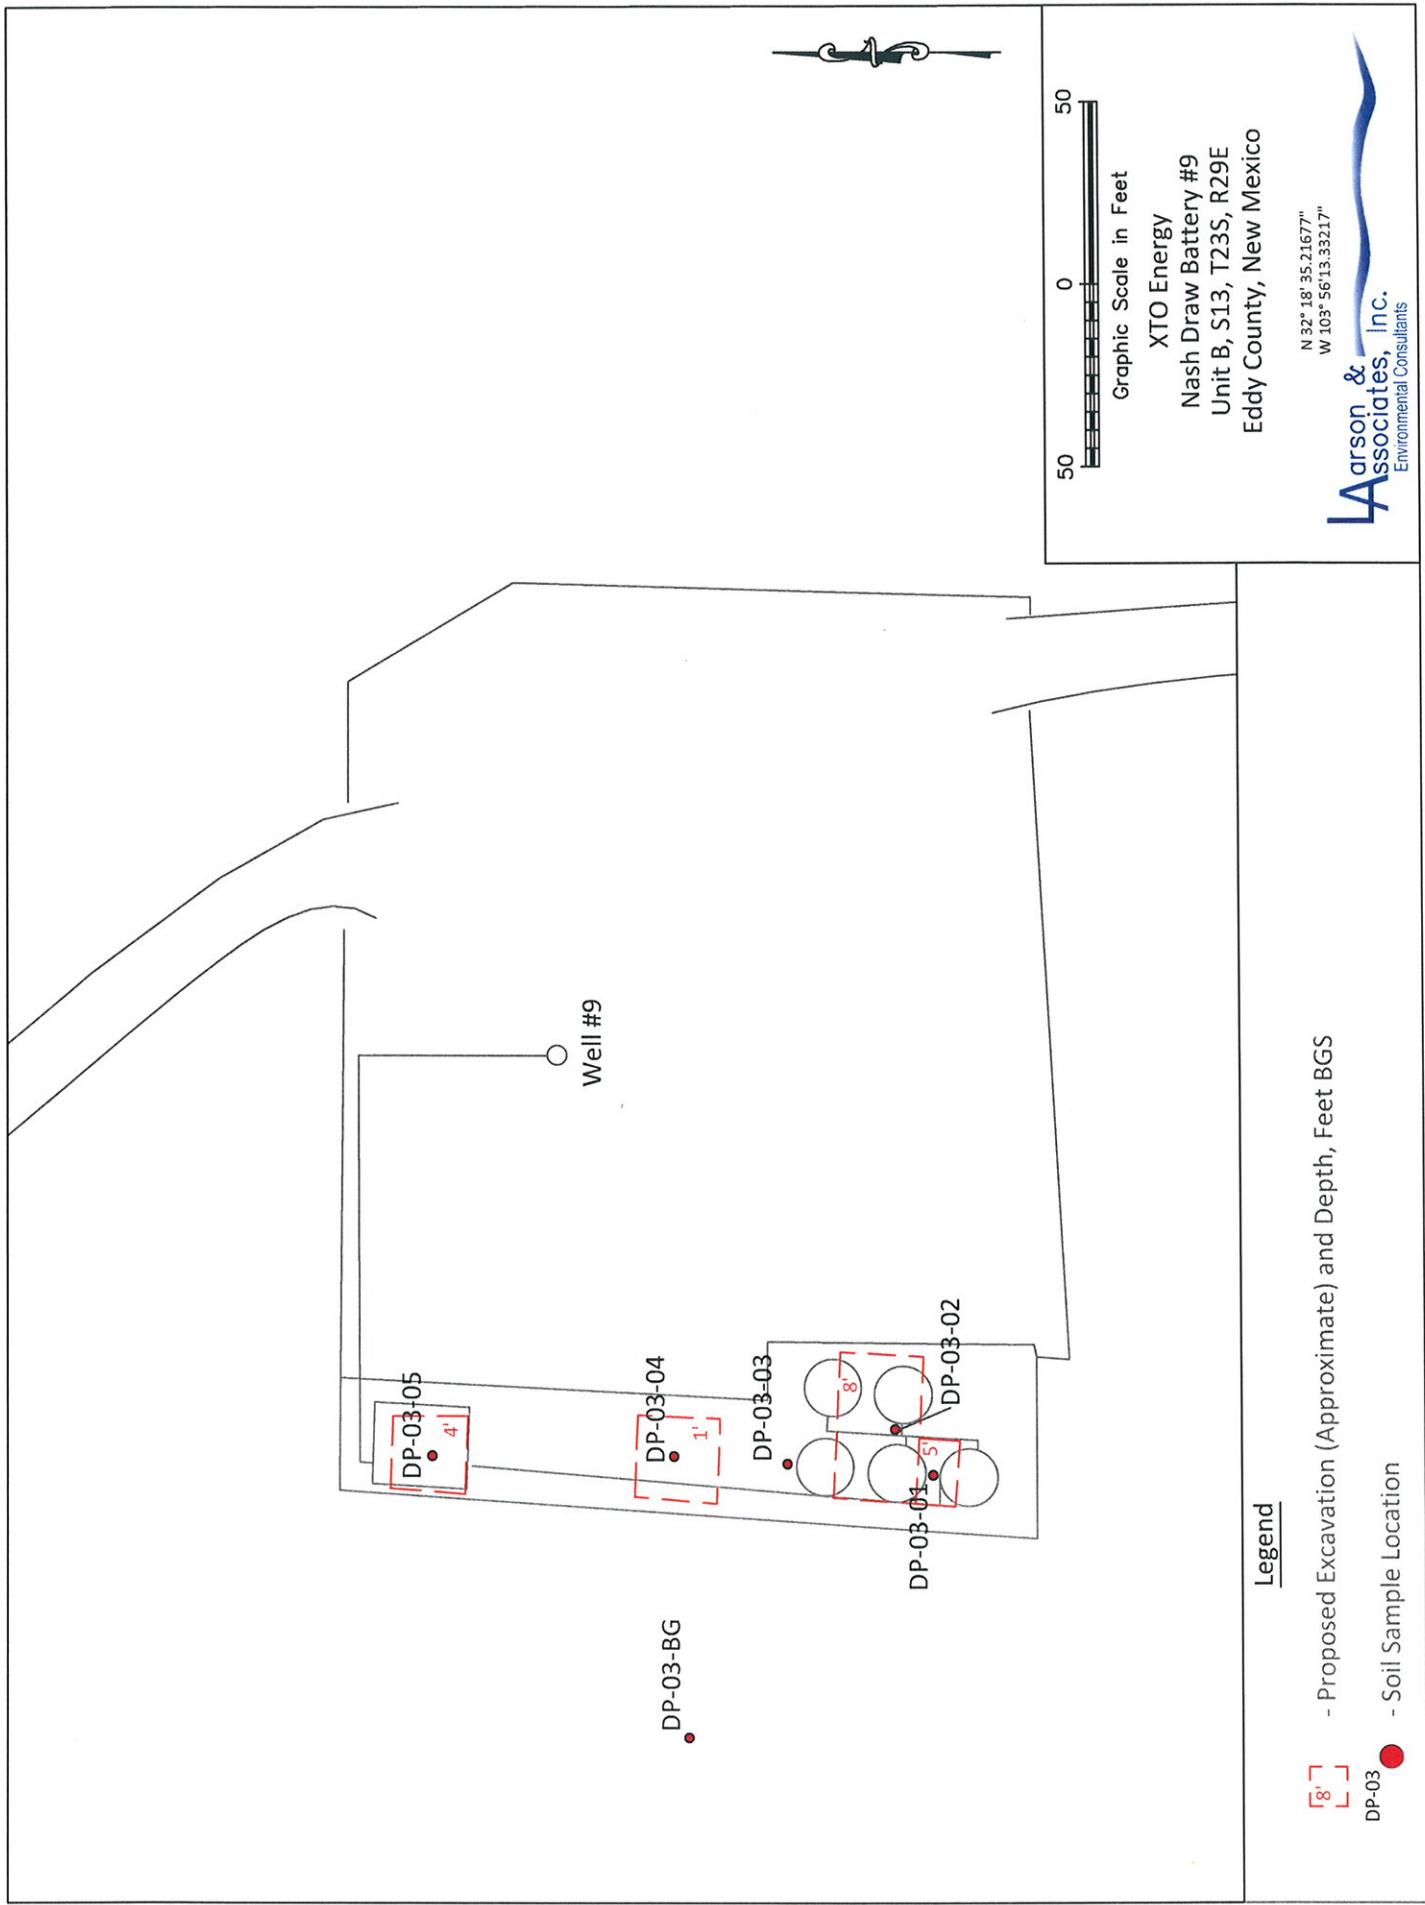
Site Map Showing Soil Sample Locations and Proposed Excavation Area and Depth
